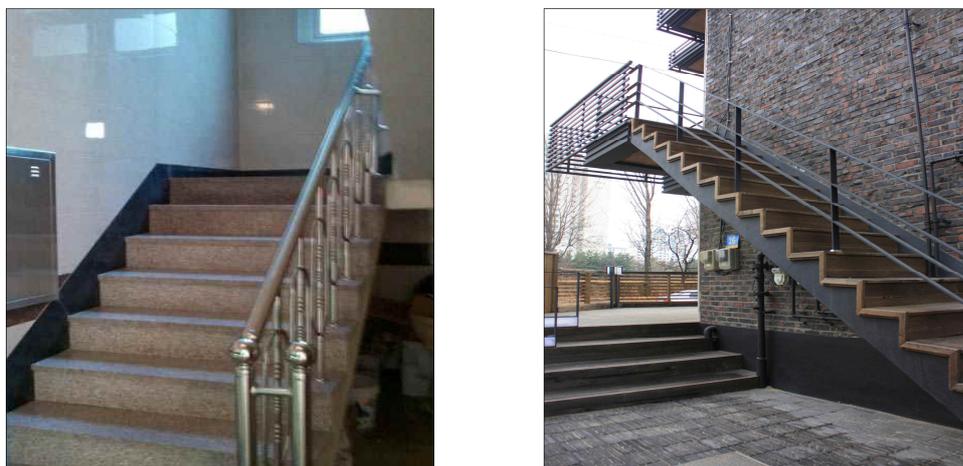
5 Building including stairwell (left) and separating stairwell (right)
